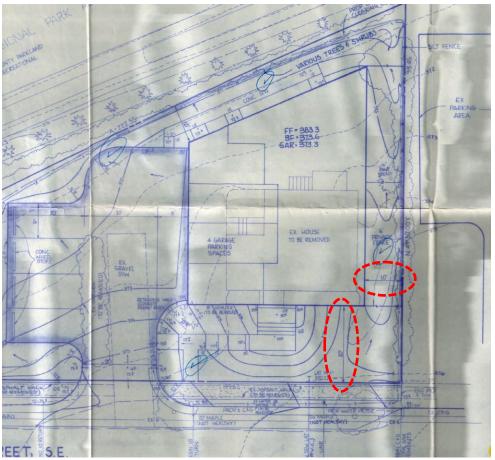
Site plan of Ayr Hill Station Condos at 207 Park Street Southeast.
